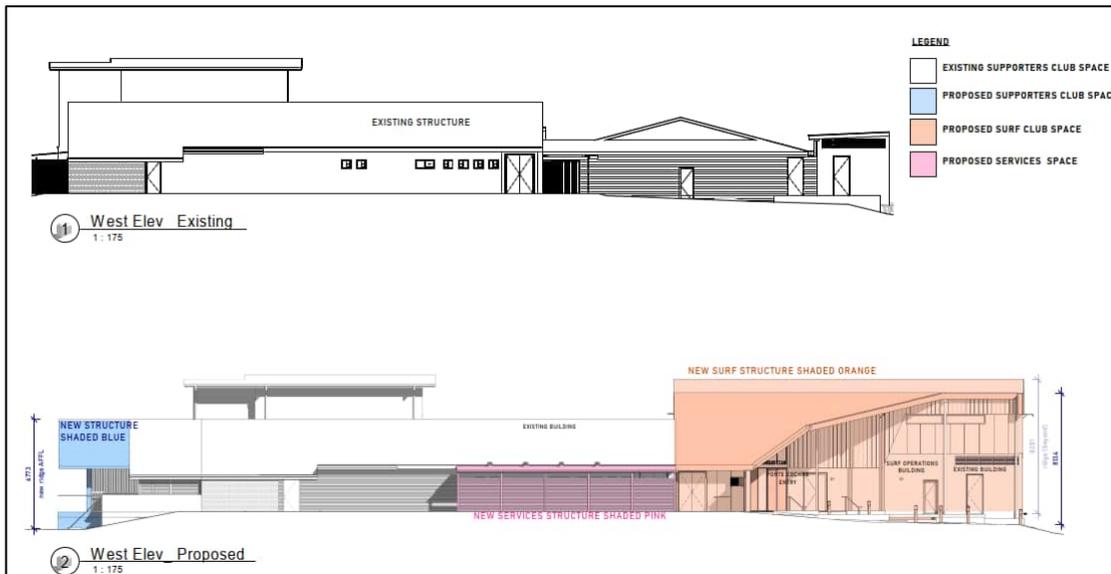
West elevation of existing building and post development scenario (Source: Buderim Design Studio 2024)
